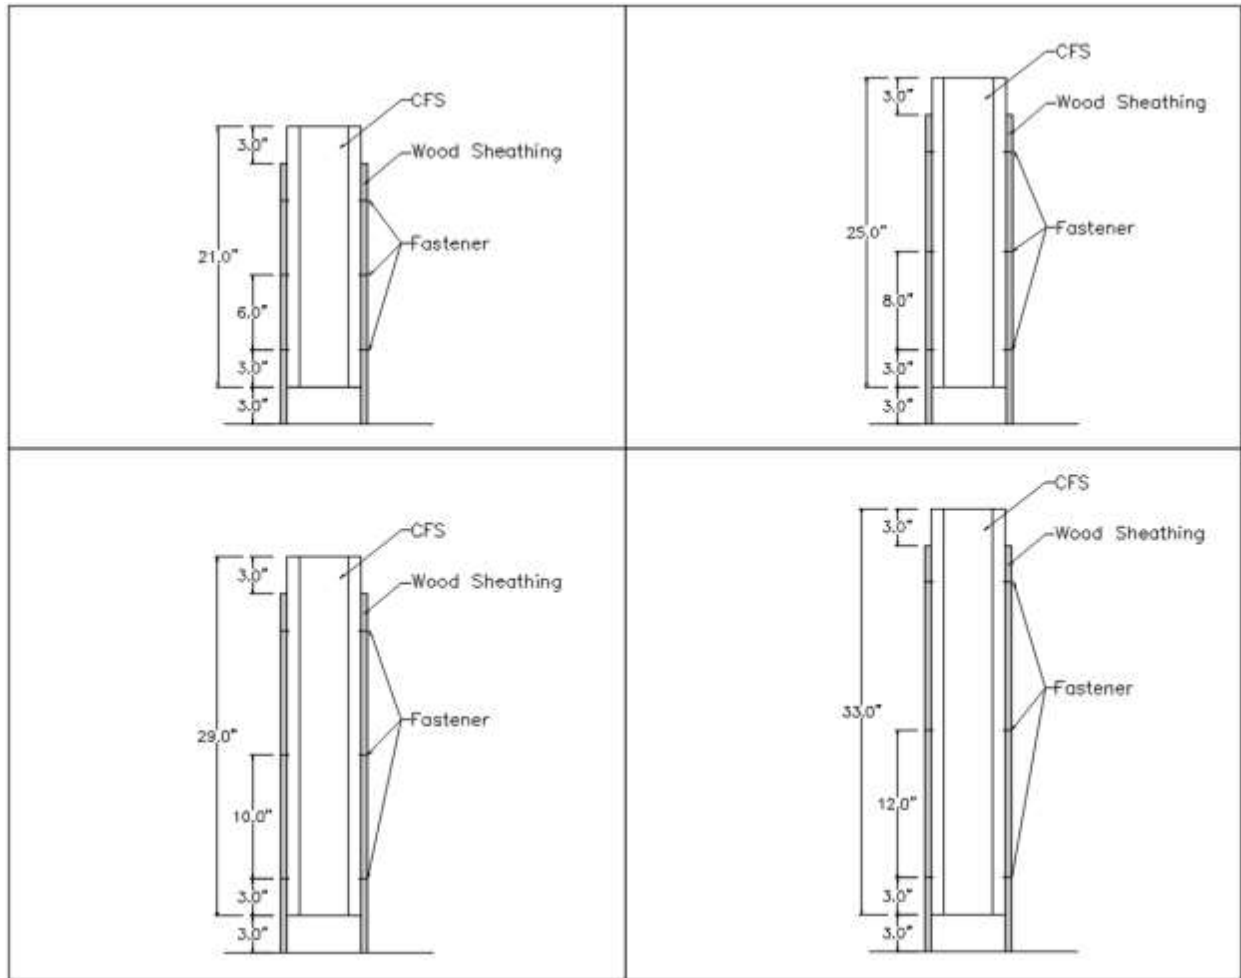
Specimen Dimensions of Loehr's Modified Setup (4)
